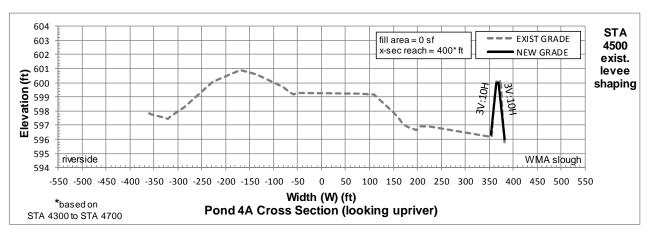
Proposed Levee Locations and Cross Sections for Pond 4A
